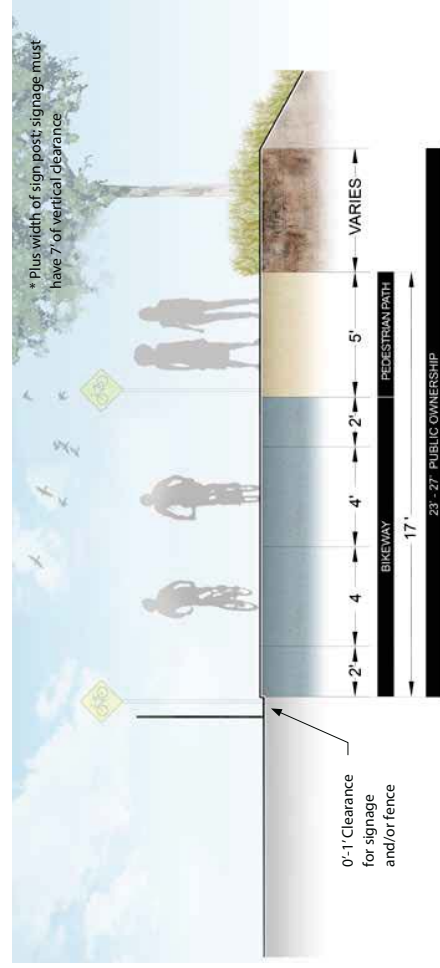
Balboa Boulevard to Burbank Boulevard (North Side) - Alternative Alignment Typical Cross Section
